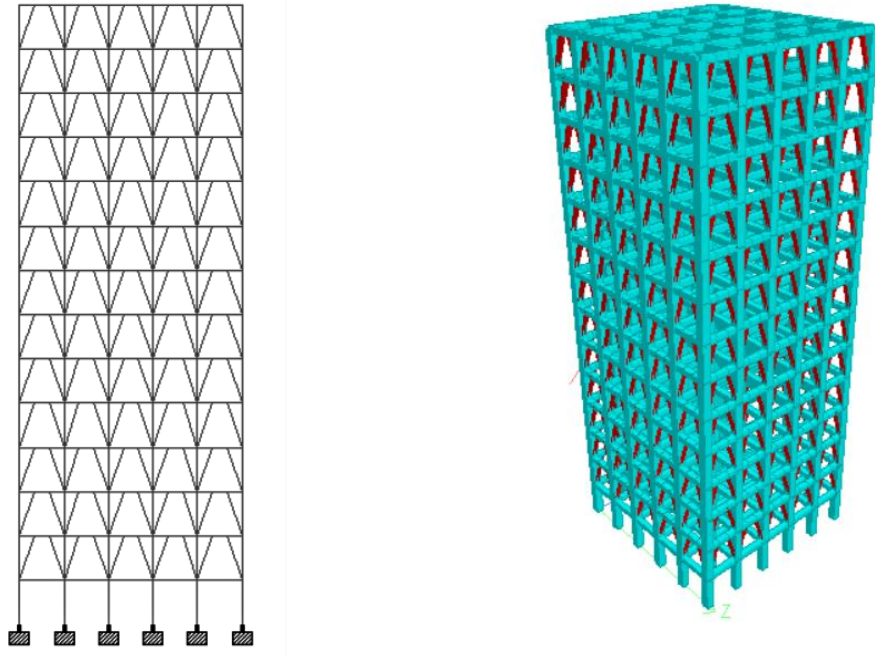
Elevation and 3D view of RC Frame Structure with V Bracing
